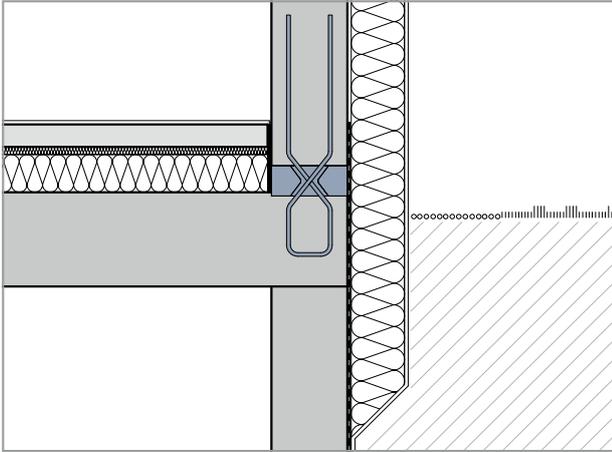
Schöck Sconnex® type M in masonry with internal walls and under-slab insulation
